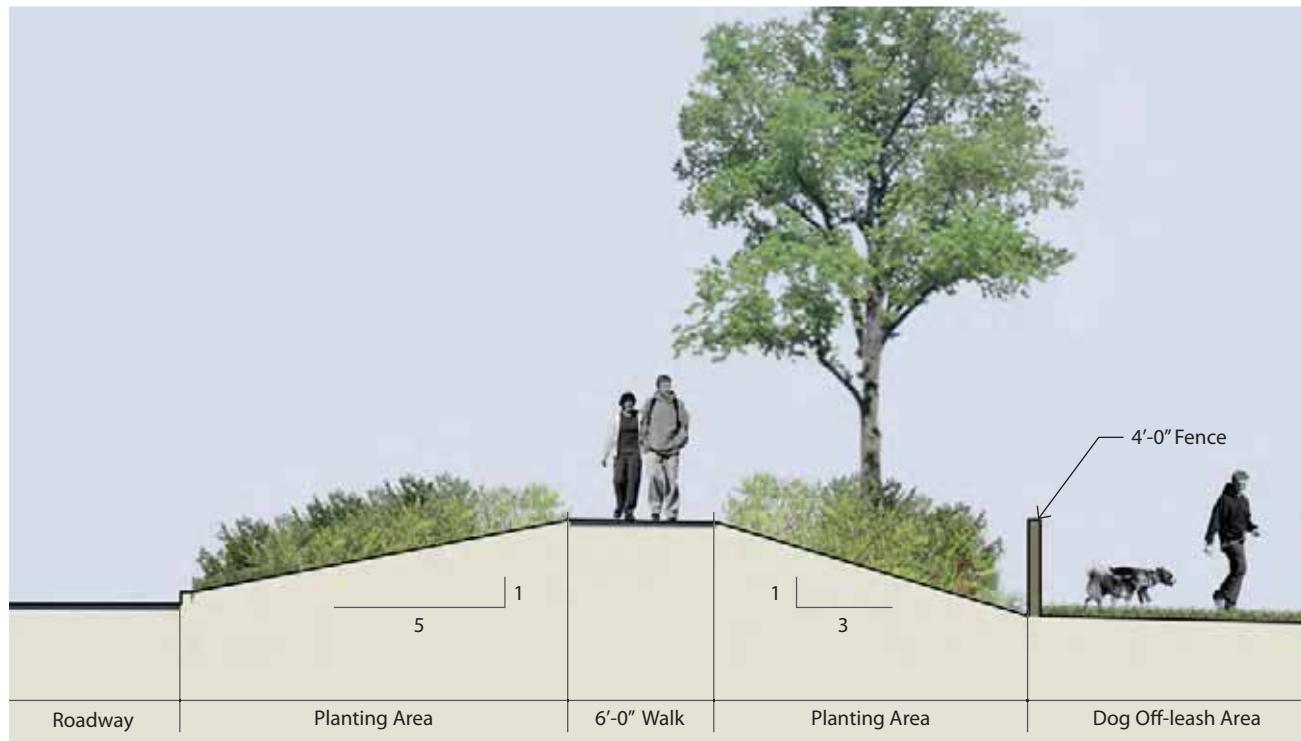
Section through DOLA at SW Nebraska Street entrance
